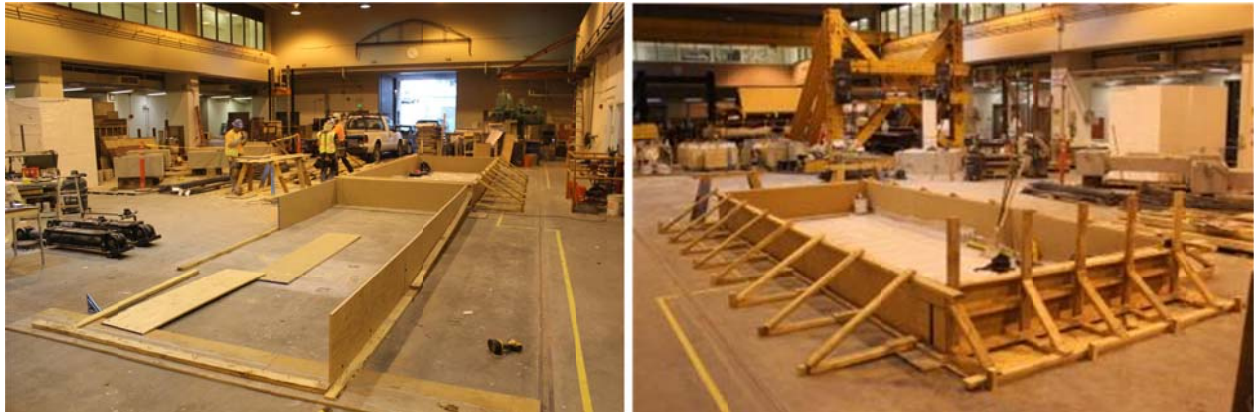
Laying out the construction space and setting up the formwork for specimen's seat beams
